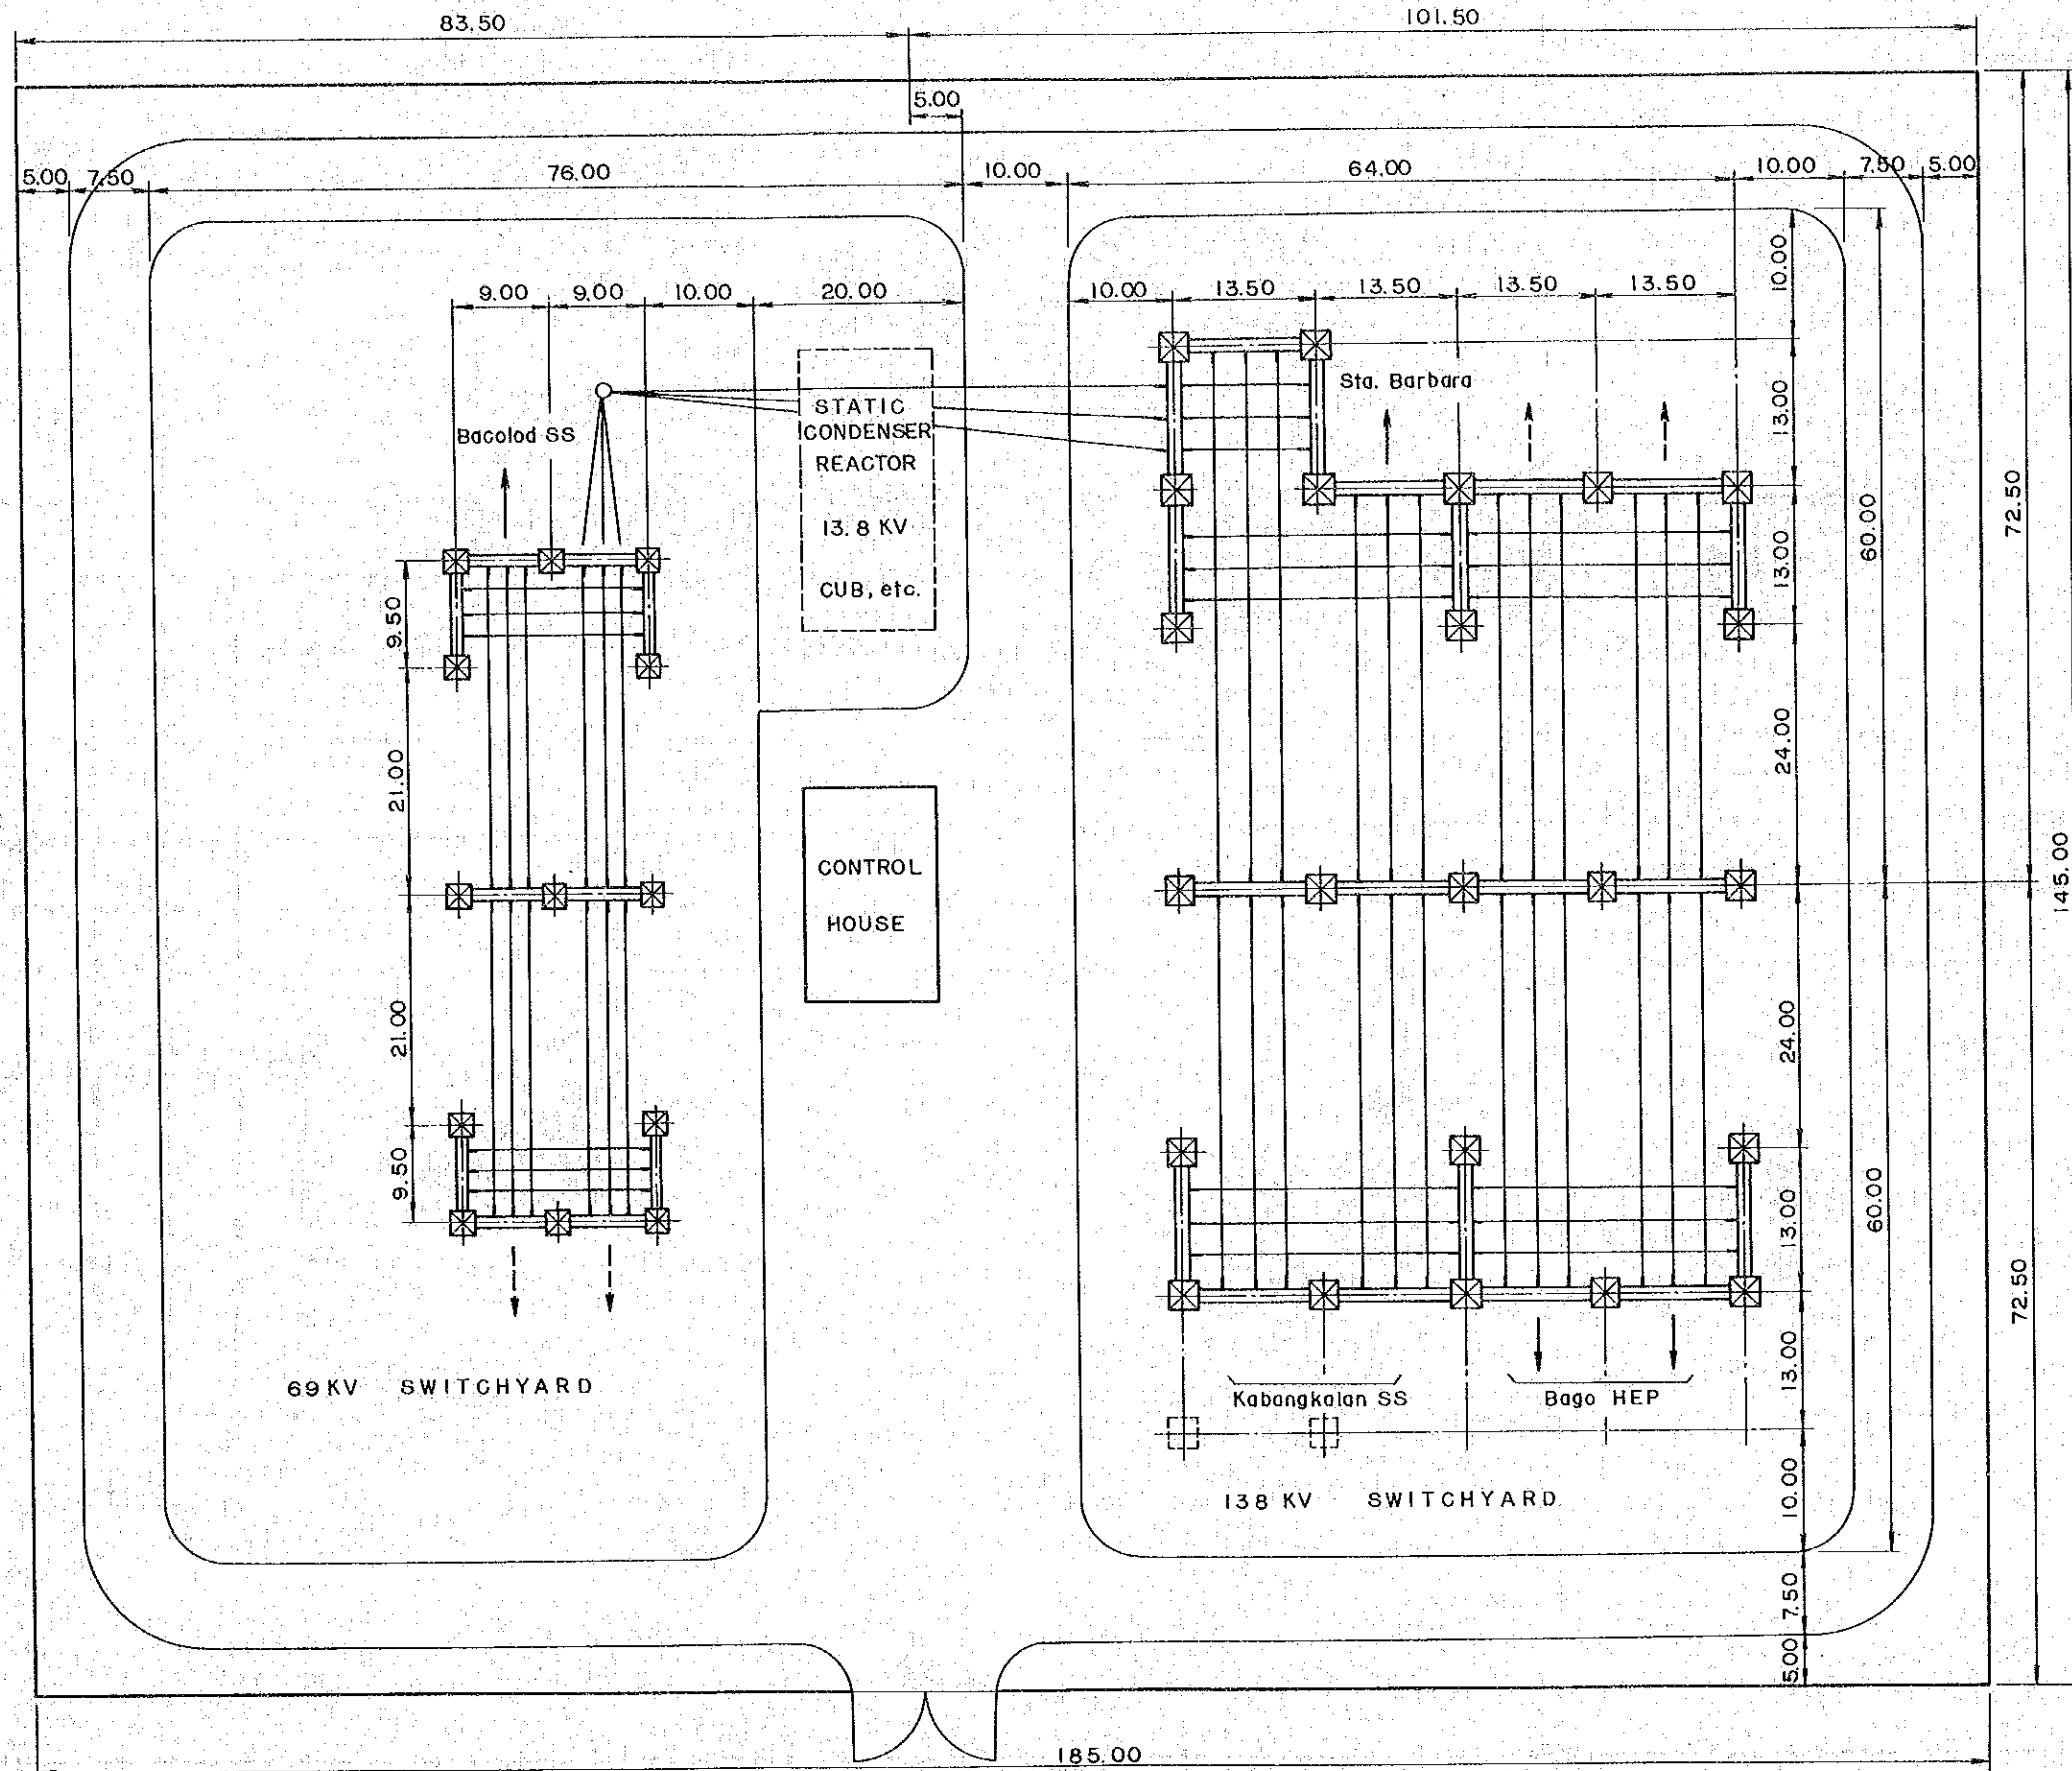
Sta. Barbara Substation Enlargement Plan (Refer to NAPOCOR Original Drawing)
